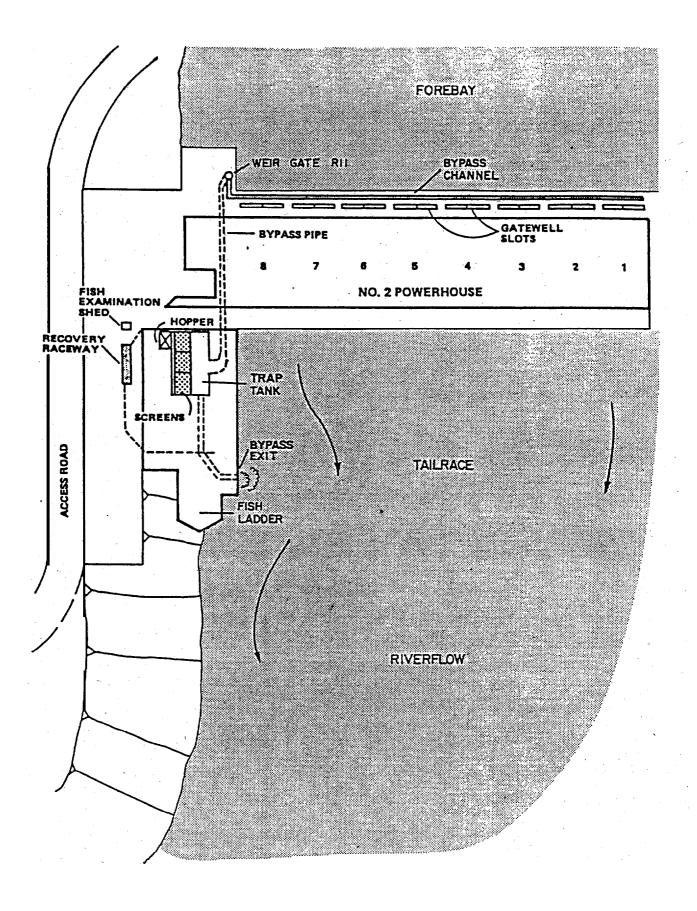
Plan view of juvenile salmonid bypass and collection system at Rock Island Dam second powerhouse (taken from Olson 1983).
